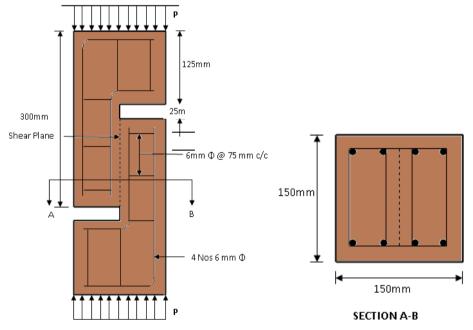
Reinforcement details and test set up for shear test by using push-off specimen
